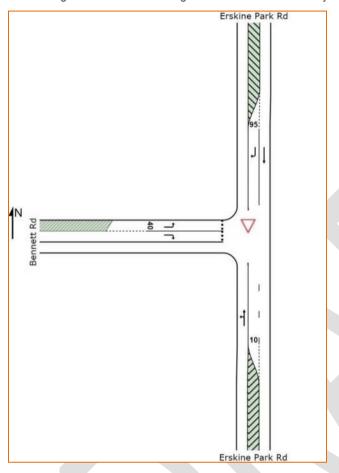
Existing Intersection Layouts assumed in the SIDRA model
